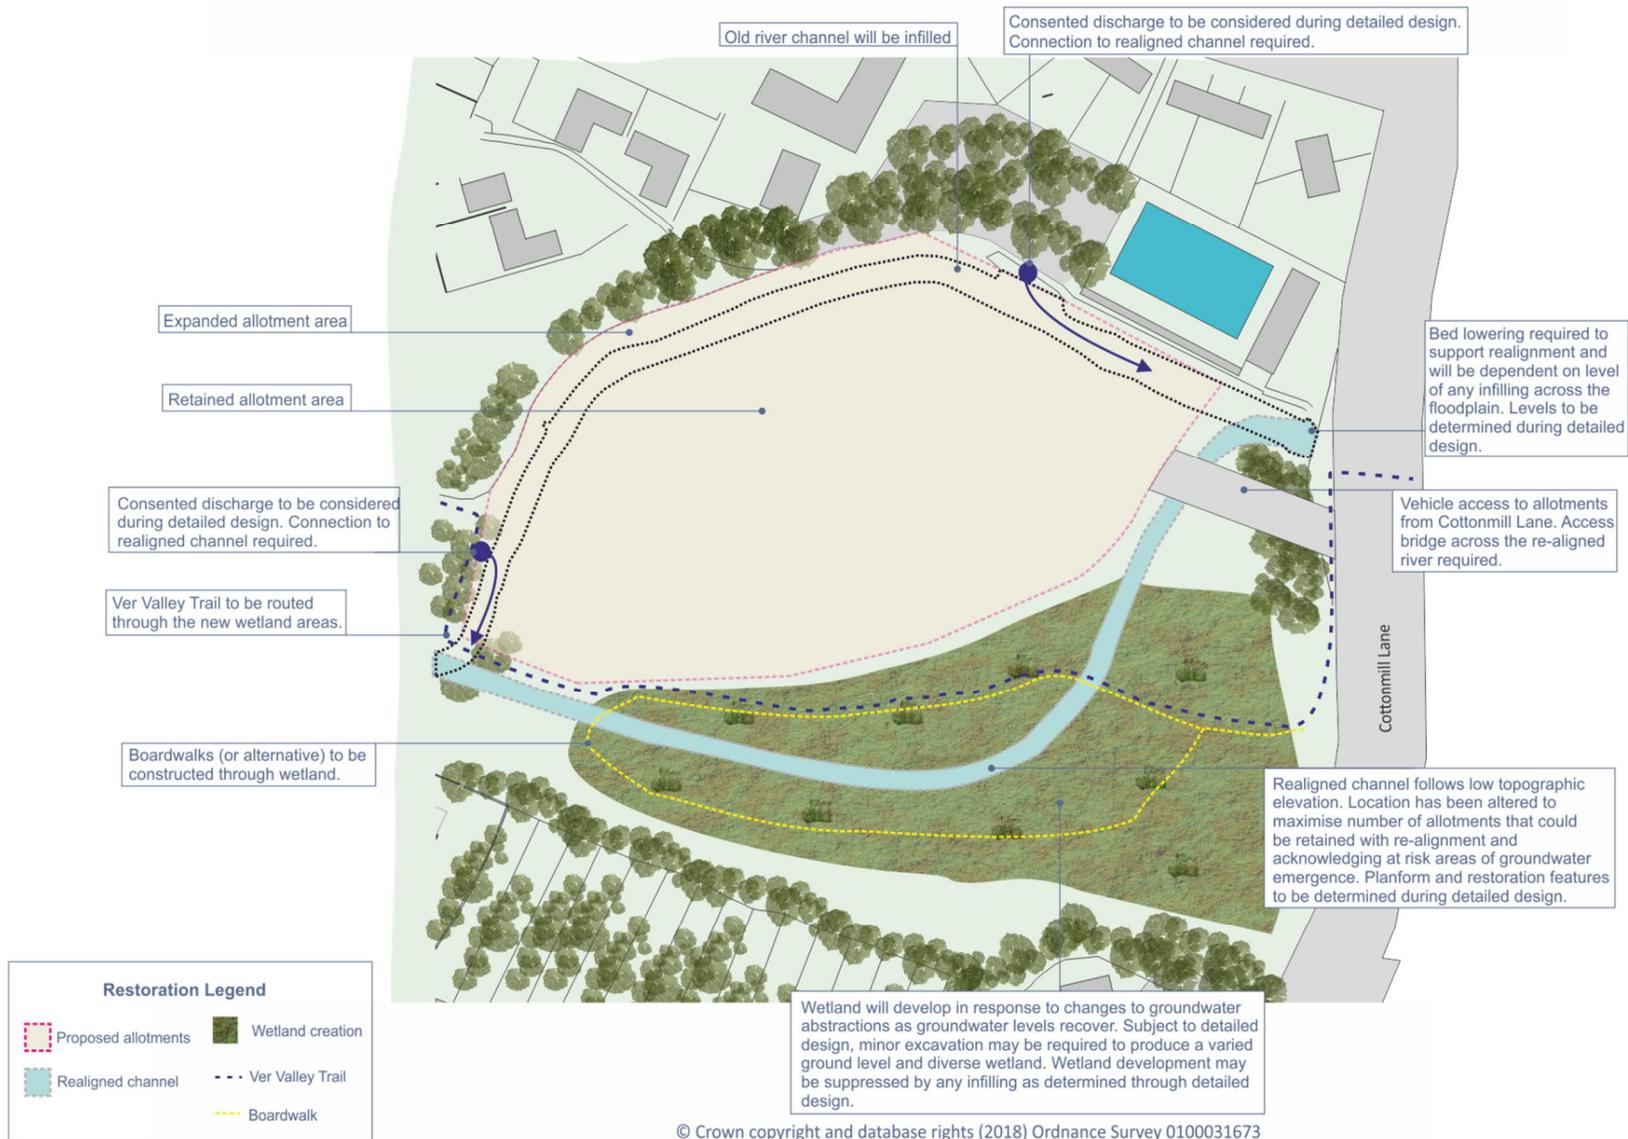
Reach 4 Final Outline Proposal Plan (post engagement)
